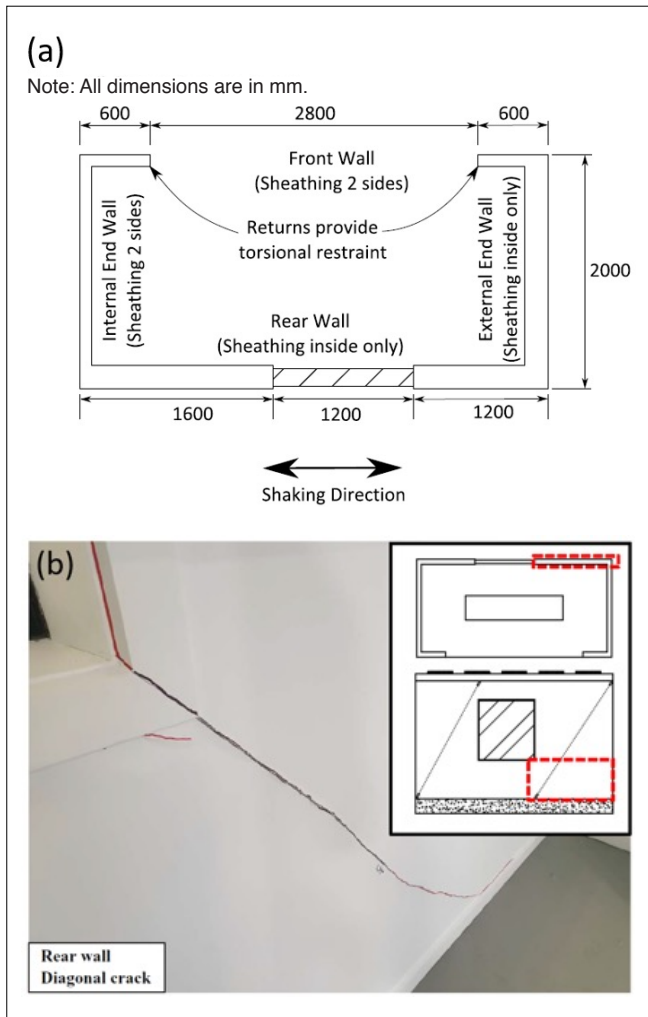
Test structure [42]: (a) floor plan; (b) diagonal shear cracking around window opening.
